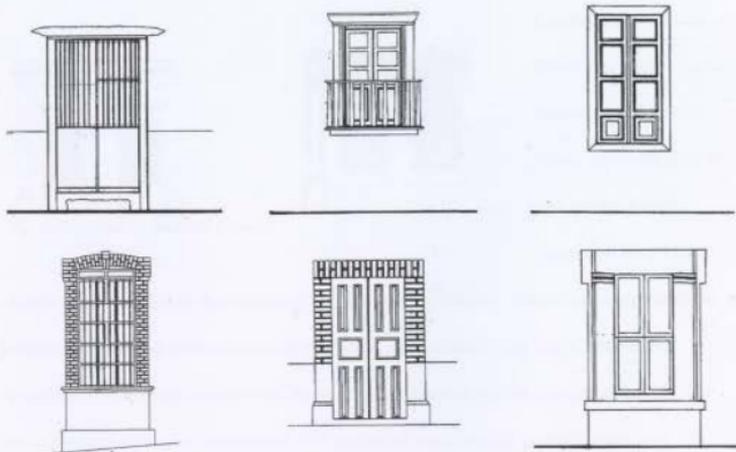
Vernacular or popular dwellings windows and doors (Gomez)
